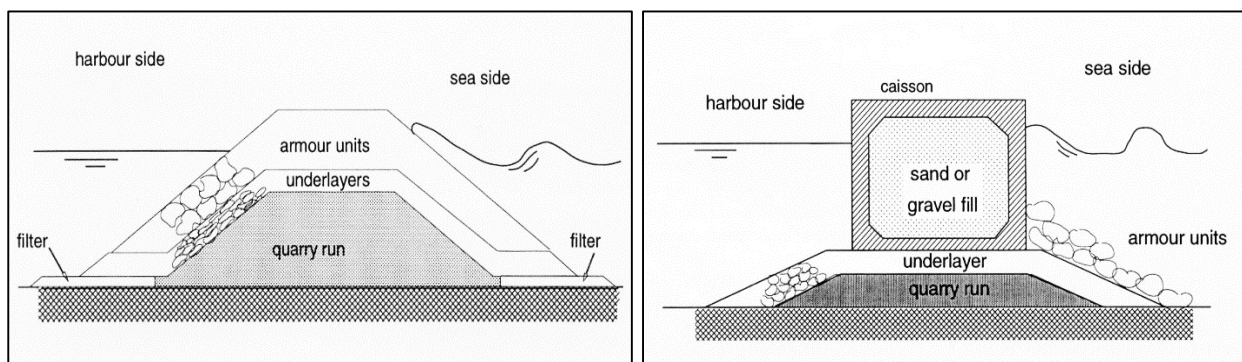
Illustration of a section of a typical rubblemound breakwater (left) and caisson breakwater (right)
